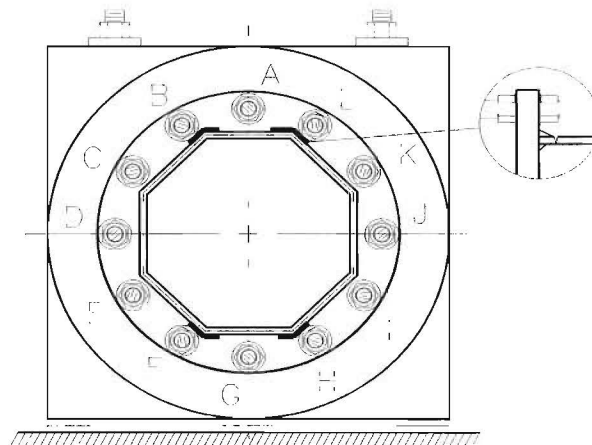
Fatigue induced cracks at toe of fillet weld in HMIP 4 1/2 UNC laboratory specimen.
